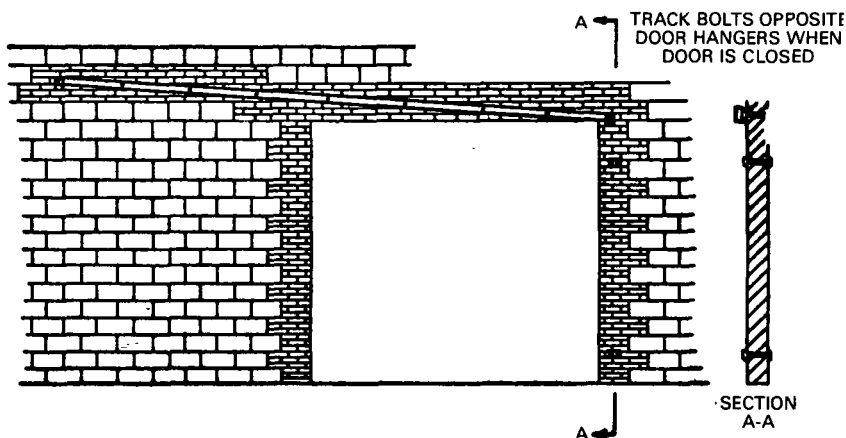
Hollow concrete masonry wall prepared for single tinclad or sheet metal sliding door, standard method.
